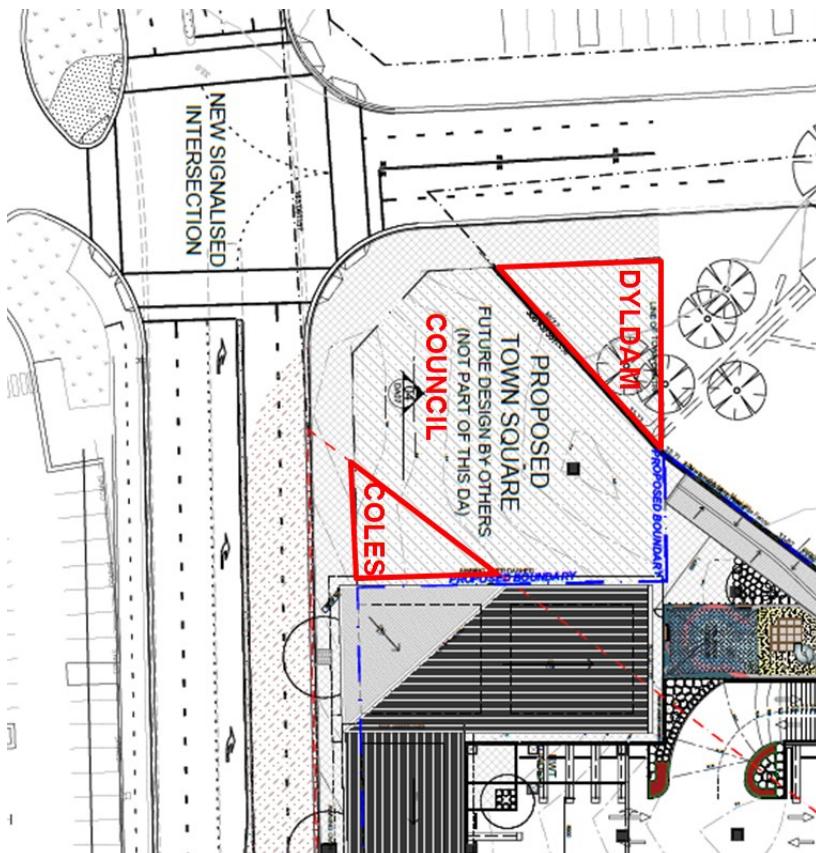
Extract from the Applicant's Site Plan identifying the components of the Town Plaza owned by the Applicant (Coles), Council and the adjoining property (Dyldam).
